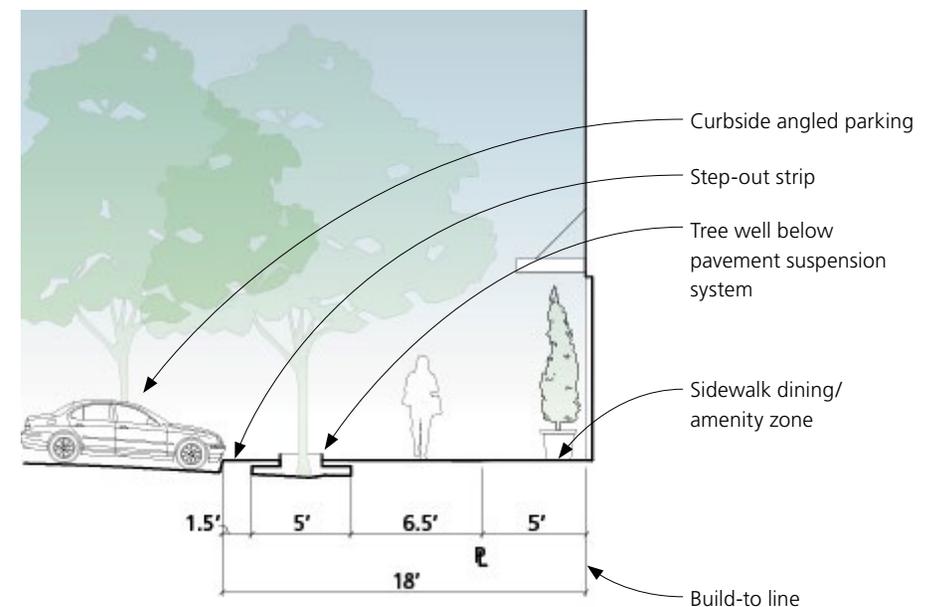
Westminster Boulevard and Gray Street Sidewalk at Angled Parking
